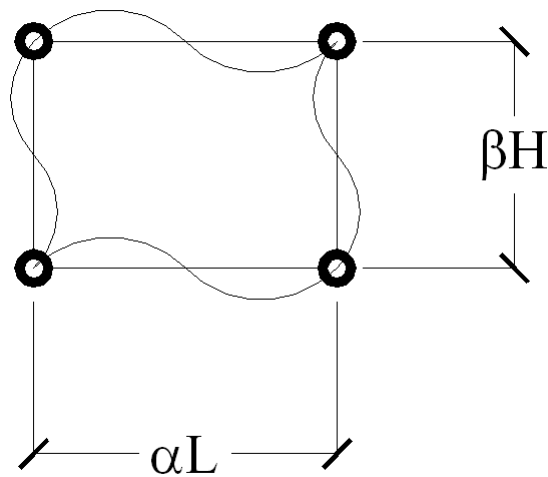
Krawinkler Model Beam/Column Joint Deflected Shape
